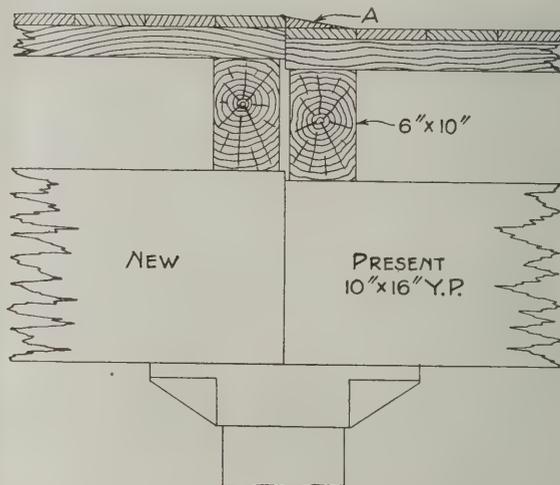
Making an Extension to a Building Where Beams are Supported on Wooden Girders
